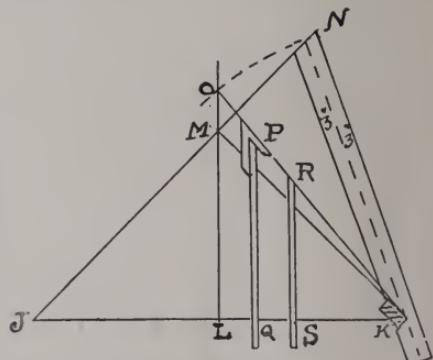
PLAN AND LAYOUT OF A SIMPLE ROOF.
